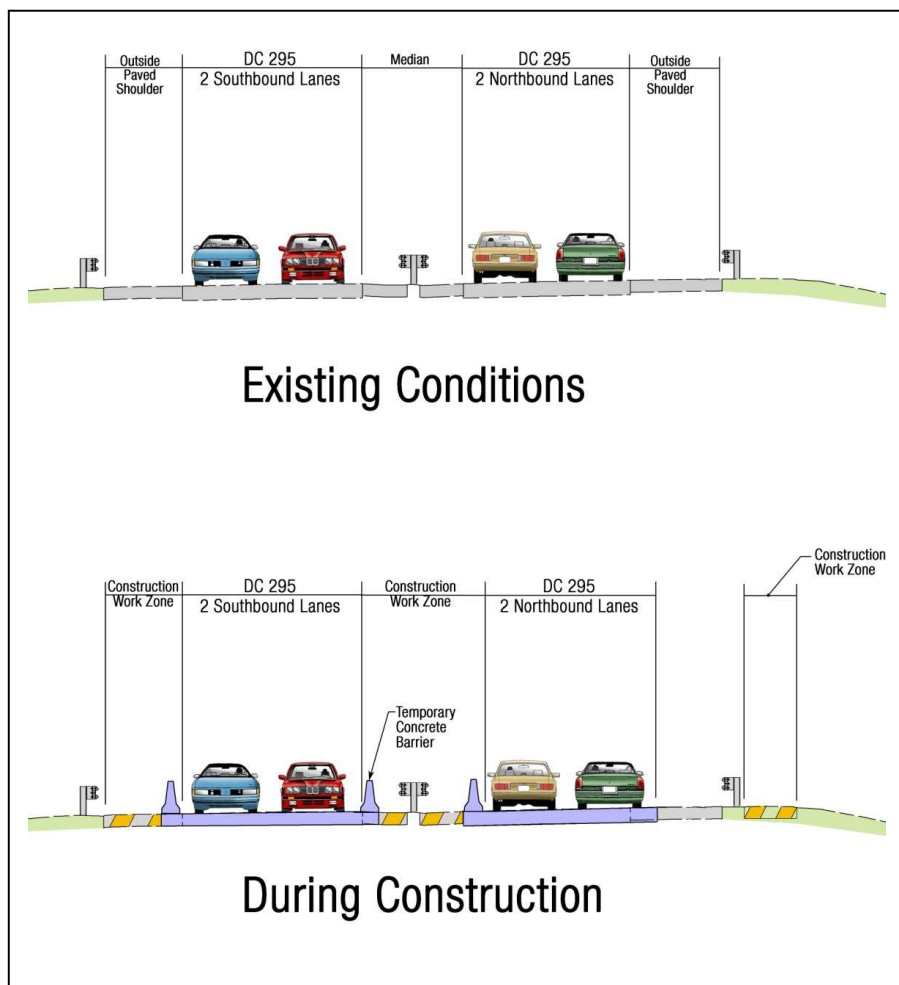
View of DC 295 traffic configurations looking north between the Pennsylvania Avenue and Howard Road interchanges before and during construction.
